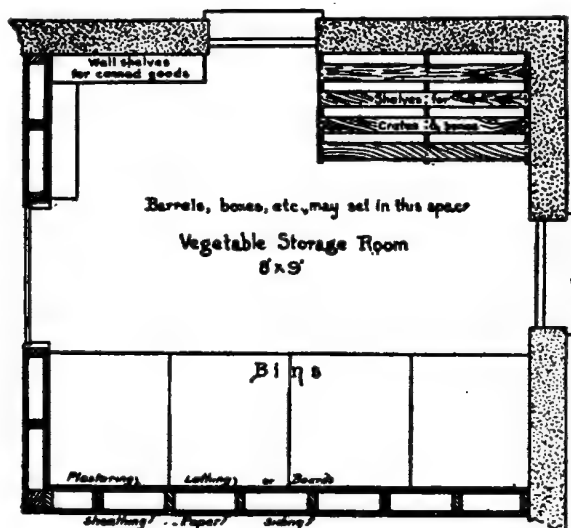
Floor plan of a storage room in a corner of a basement. The arrangement of the shelving and bins may be changed to suit conditions. While the construction of the wall may be varied, it must be tight.—U. S. Dept. of Agriculture.
